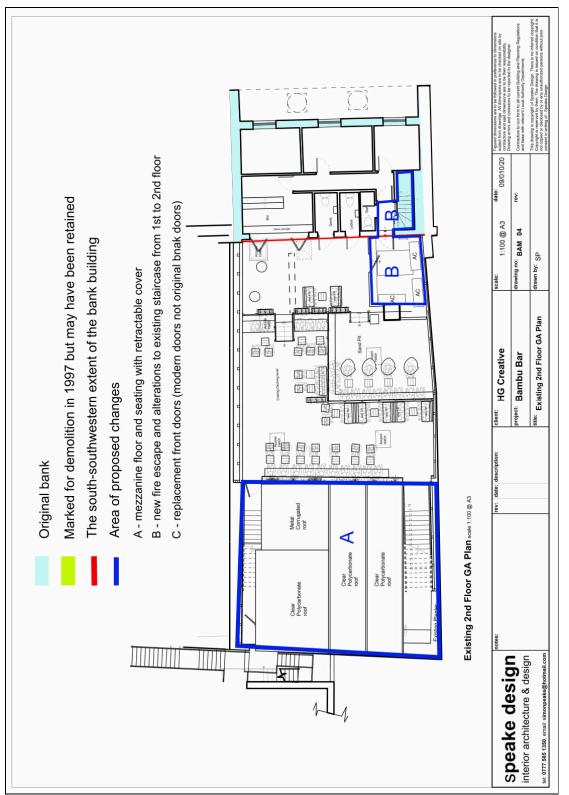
; A plan of the second floor showing original and modern fabric. The fire escape stairs and entry area are marked B. The modifications will not remove or damage historic building fabric as the original stairs are sealed beneath a new staircase.
